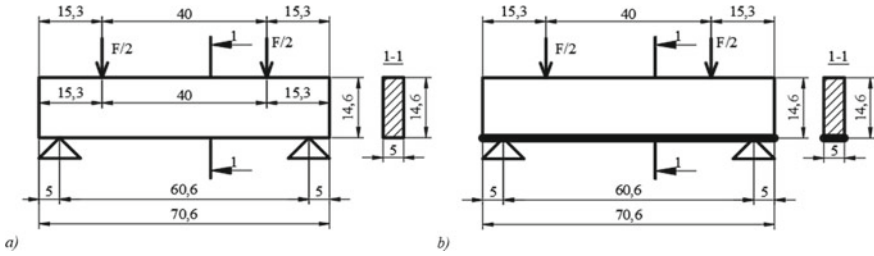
The loading and reinforcement mode for girder models under simple bending: a girder model without reinforcements—B1; b girder model with carbon fiber reinforcement applied all over the lower plane—B2
